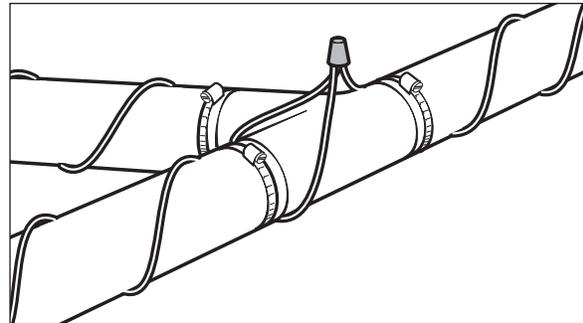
Wrap bare copper wire on outside of ductwork to prevent static build-up on surface.
